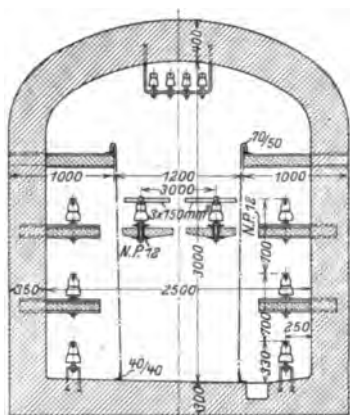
Cross-Section of Cable Tunnel leading across Boundary, between Power House, Brusio, Switzerland, and Step-up Station, Piattamala, Italy.
